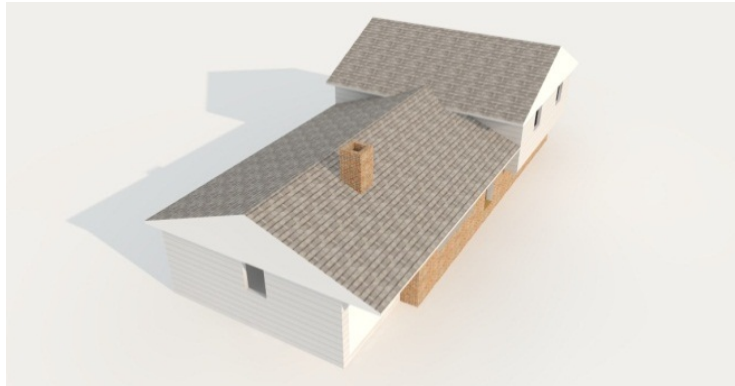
Aerial view of a typical 3 bedroom, 1 bath split-level house facing east.
